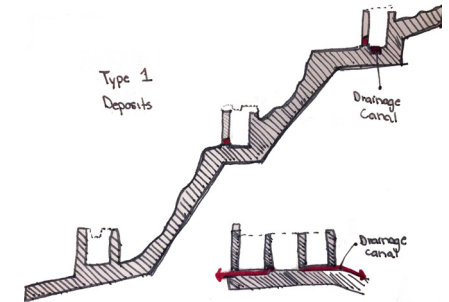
The drawing demonstrates a transversal section of the deposit type one structures, highlighting the drainage and ventilation canals.
